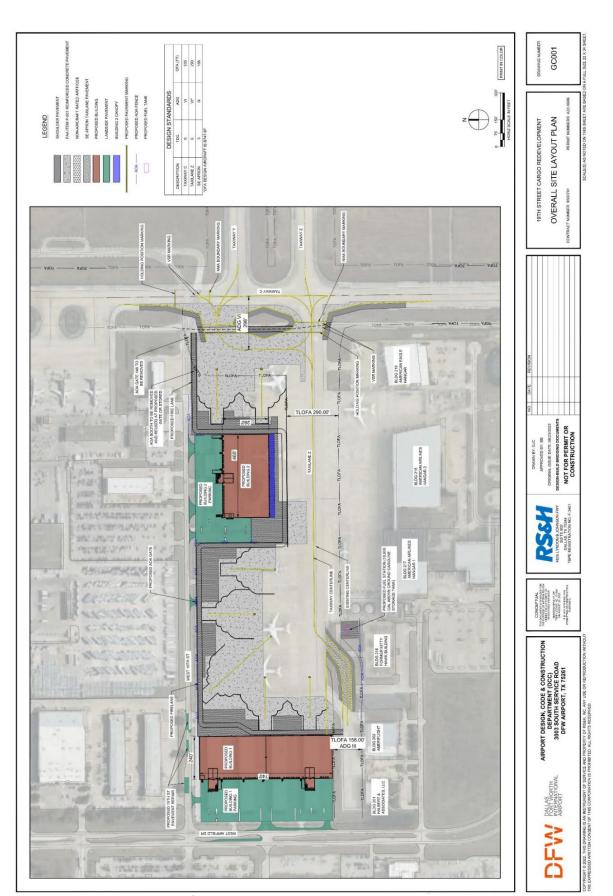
Proposed 19<sup>th</sup> Street Cargo Redevelopment Project Site Plan
